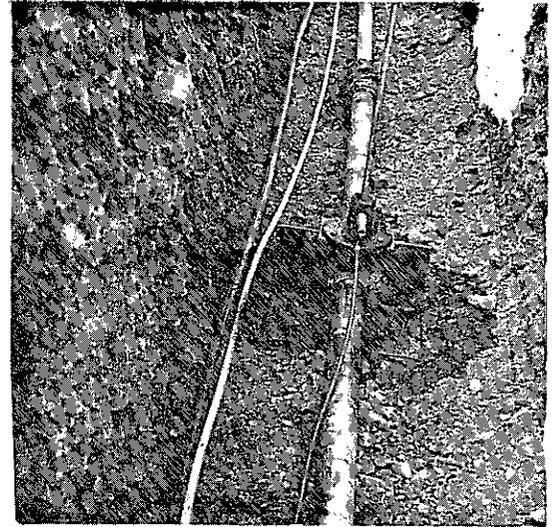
Typical installation of new type horizontal movement platform with settlement device partially assembled on top (electrical reading device omitted).
